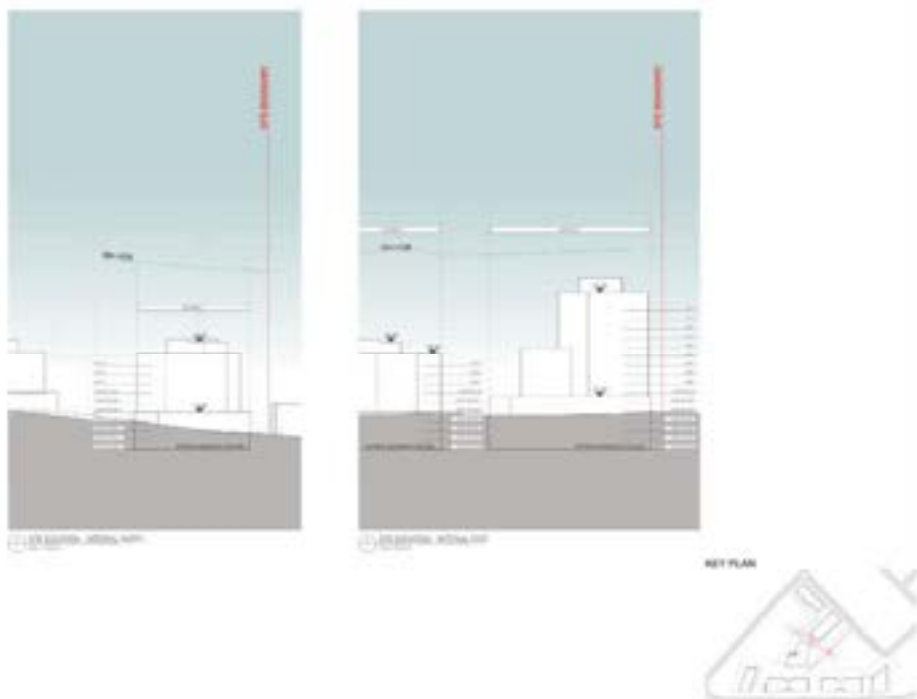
PP01.18 Site Envelope Elevations – Internal North and Internal East. *Source:* Fender Katsalidis 2023.
